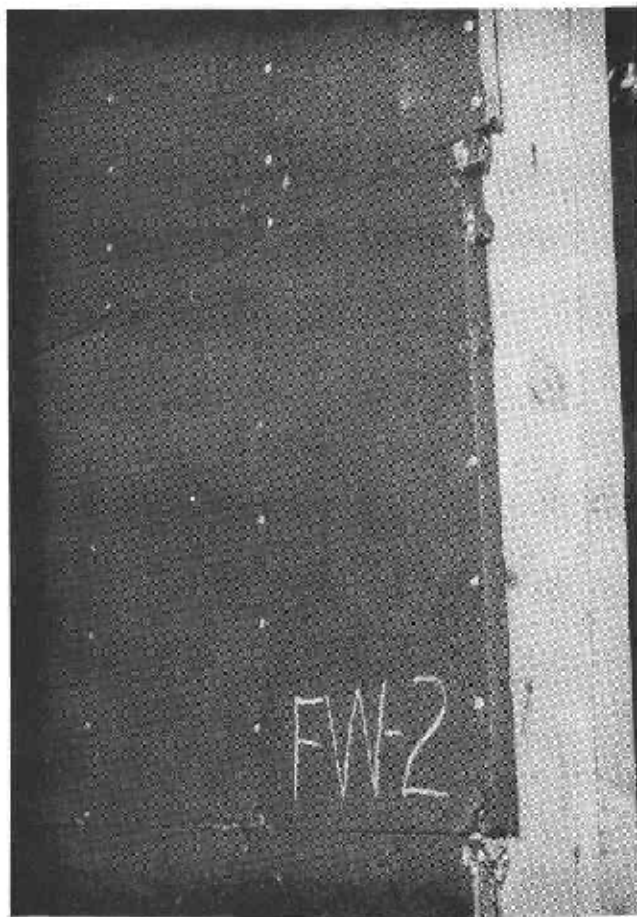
Typical failure of 2- by 8-foot sheets of fiber-board in racking tests.
